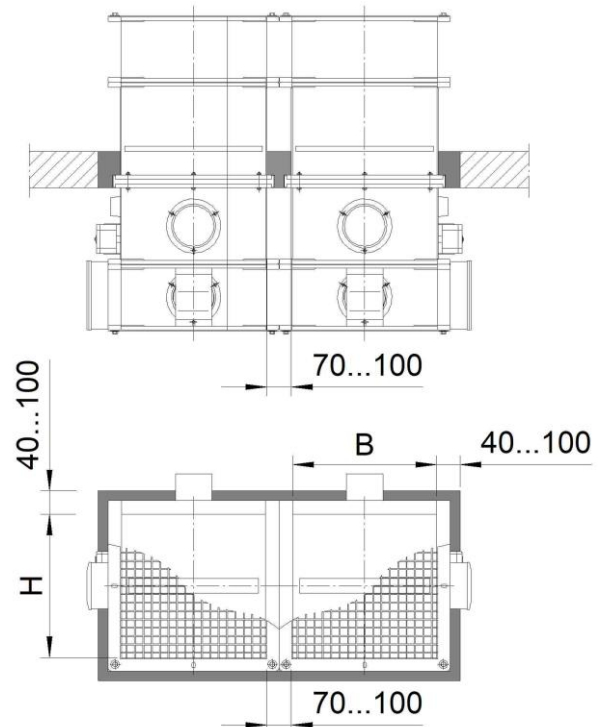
Installation in solid ceilings at a reduced distance "flange-to-flange"
